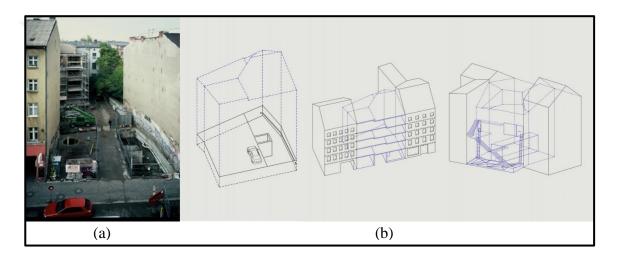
Brunnenstrasse 9, Brandlhuber+ Architects and Urban Planners, 2010. (a)
